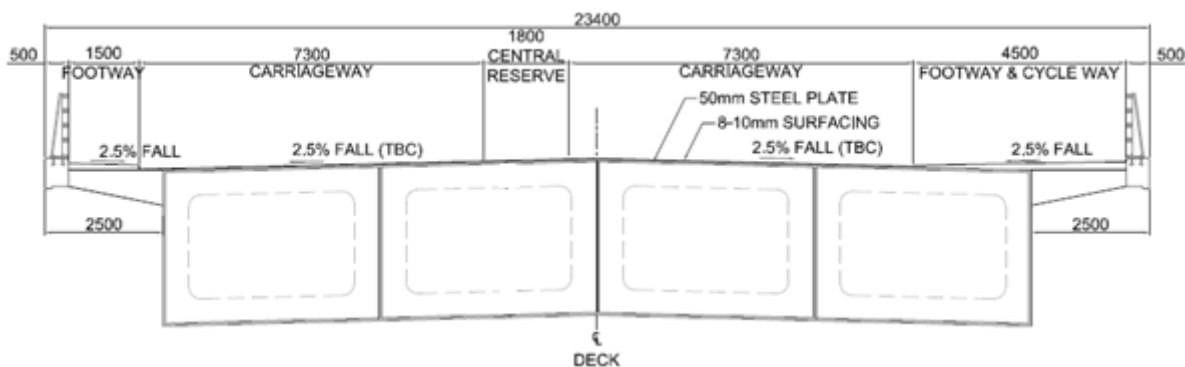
Box girder arrangement deck (adapted Mouchel/WSP report)
